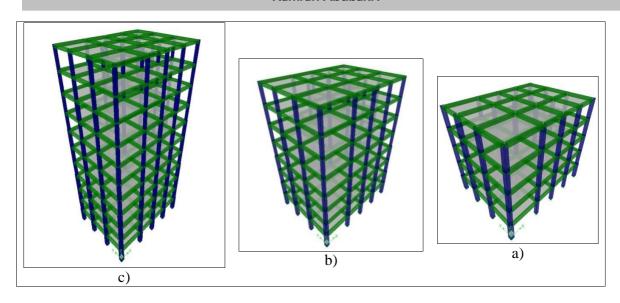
a) 5-story structure, b) 8-story structure, c) 12-story structure
